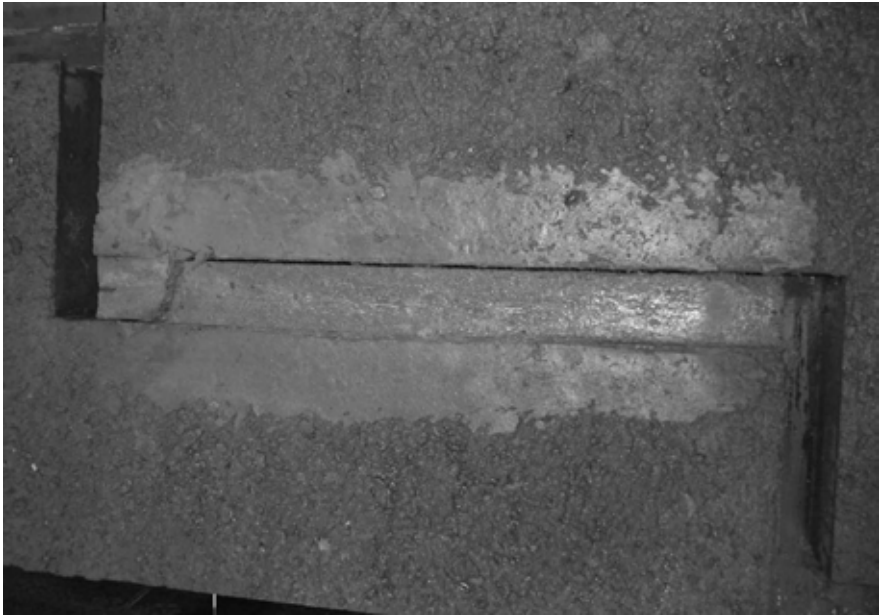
Typical failure in test specimens, joint detail 5, test no. 5.3, CRC JointCast, straight reinforcement with 40 mm overlap, three indentations 90 x 40 mm
